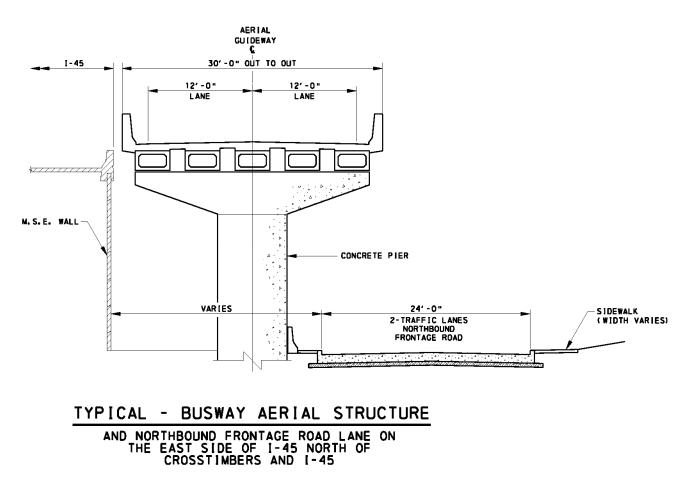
Typical BRT Aerial Structure Adjacent to IH-45
